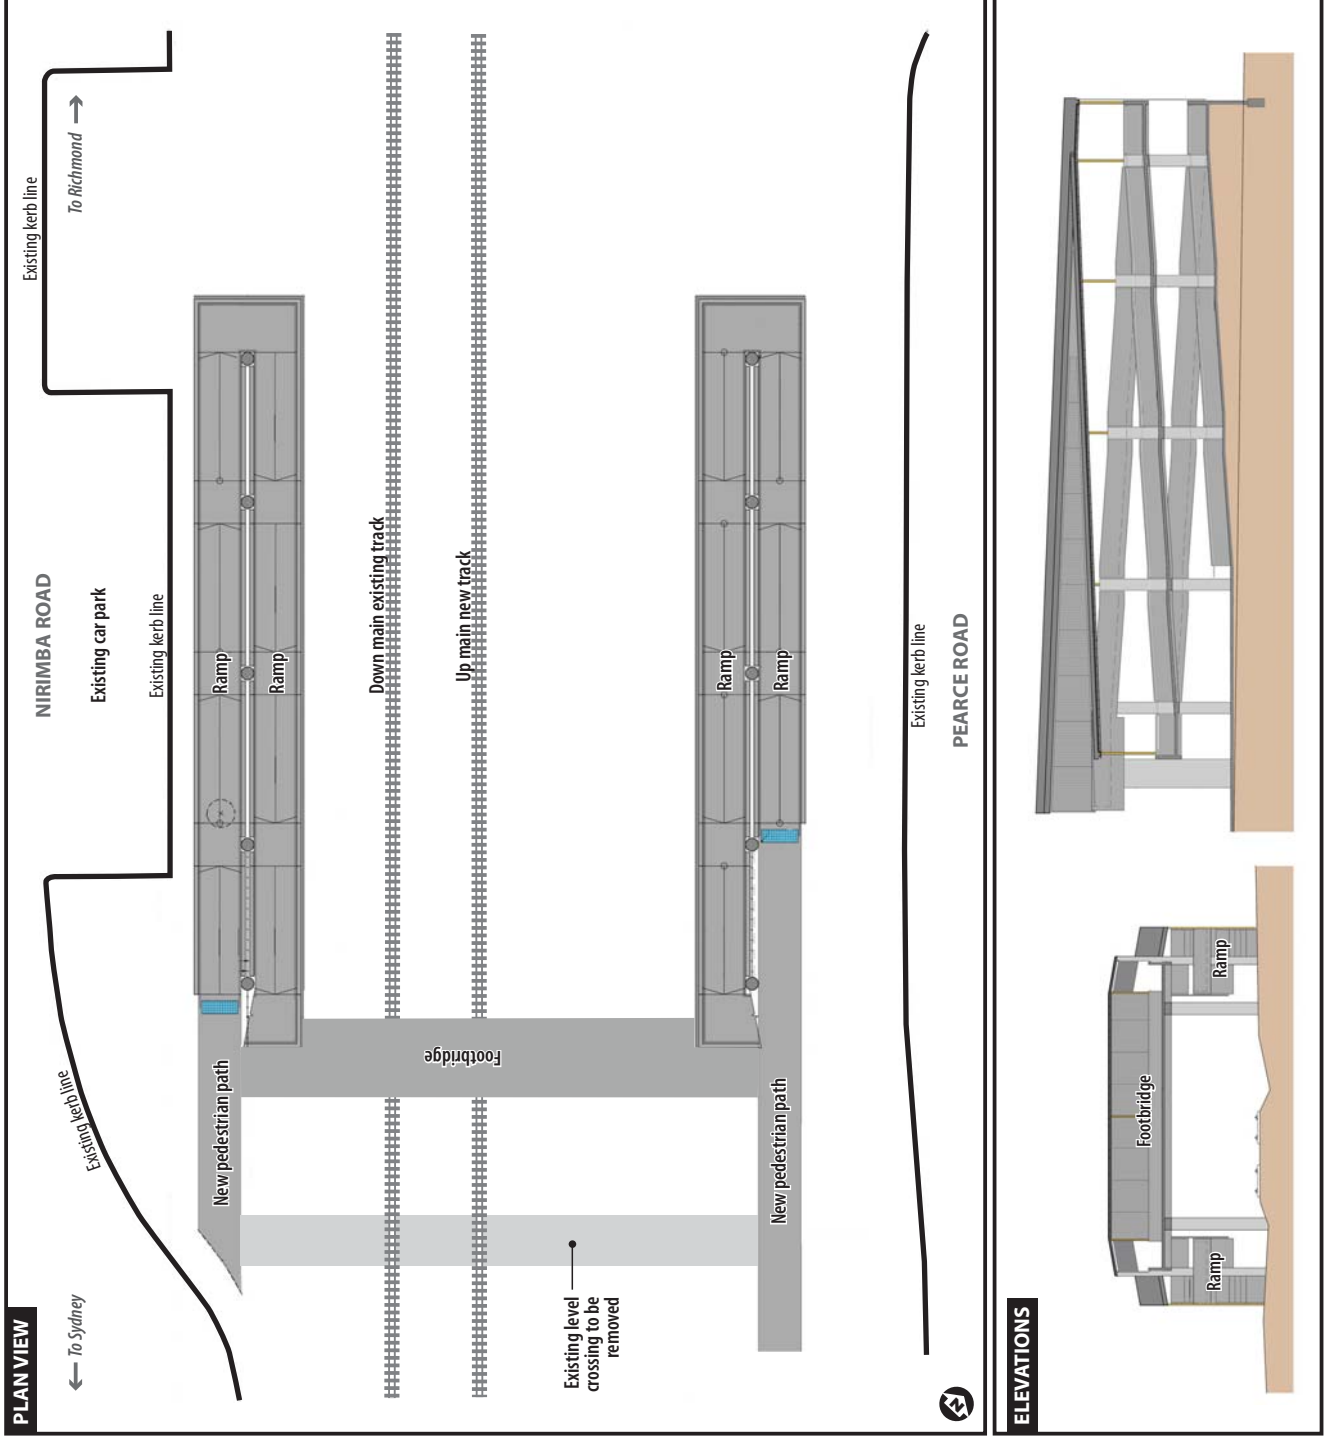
Quakers Hill Station pedestrian overbridge (plan view and elevations)
